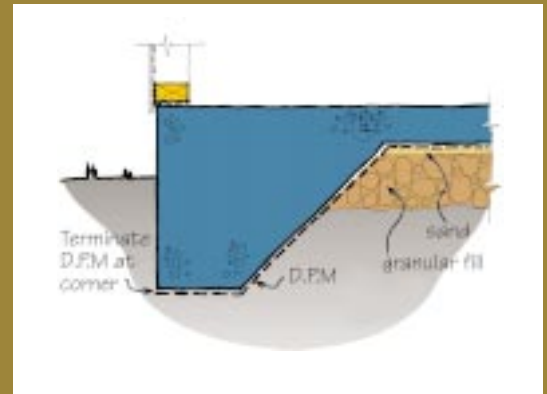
Damp-proof membrane stopped at foot of foundation wall
